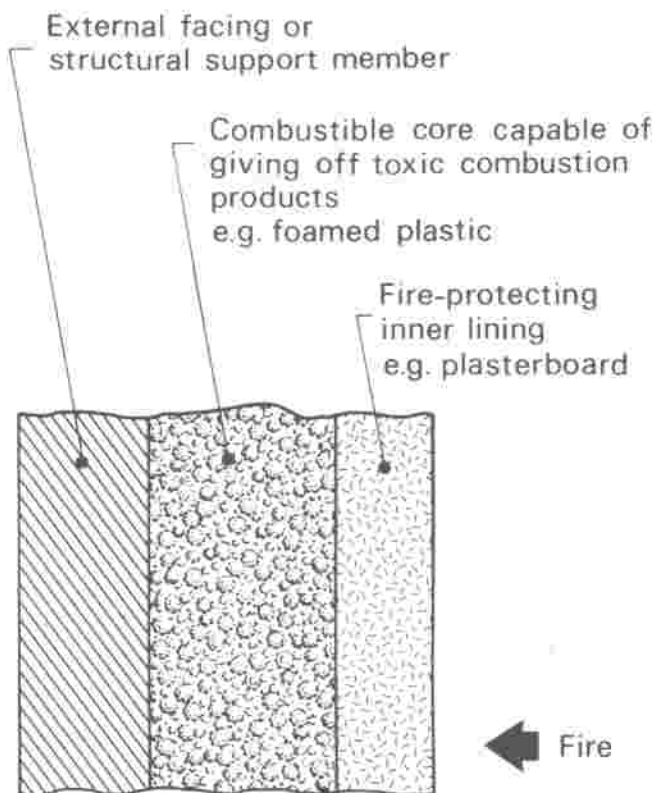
Use wall panels with an effectively fixed fire-protecting inner facing such as plasterboard which does not decompose, disintegrate or shatter in fire
